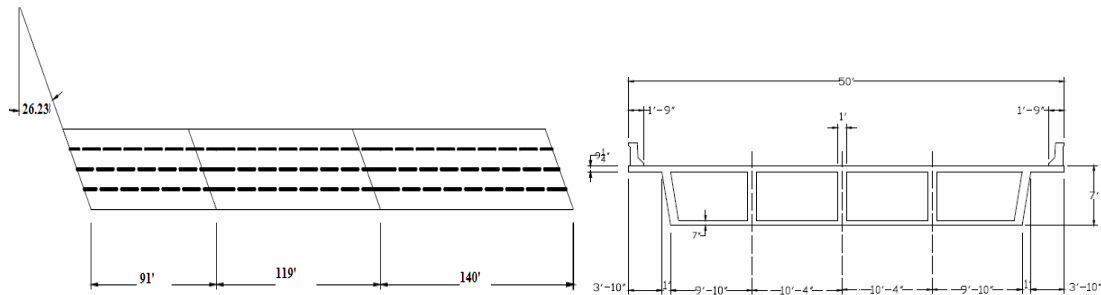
Bridge No.3 multicell beam, plane view and cross section
